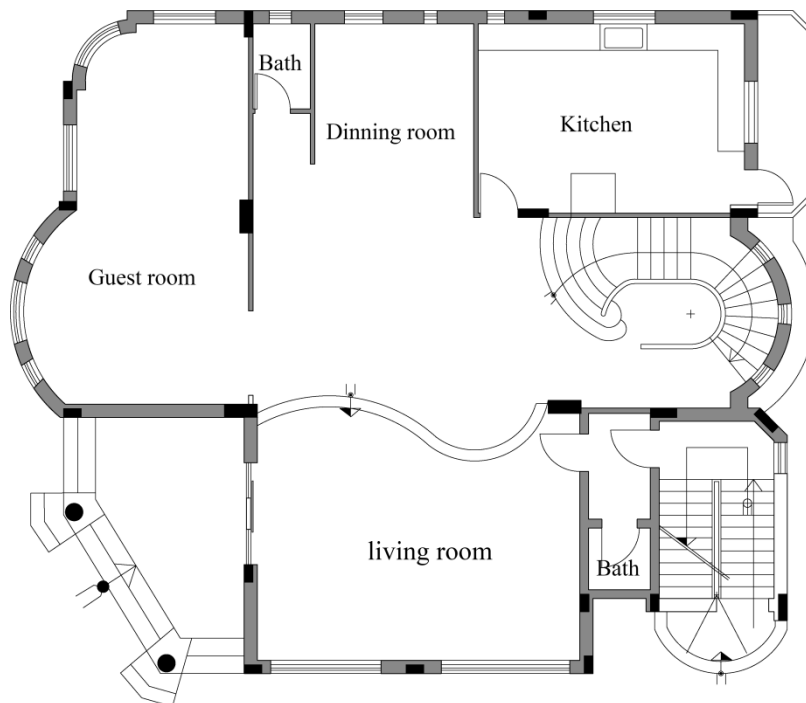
Ground floor Plan of Al-Rodaisy house
